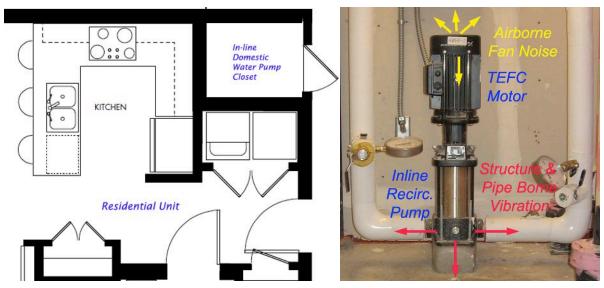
(a) Pump Closet Plan and (b) View of In-line Pump Installation.³
